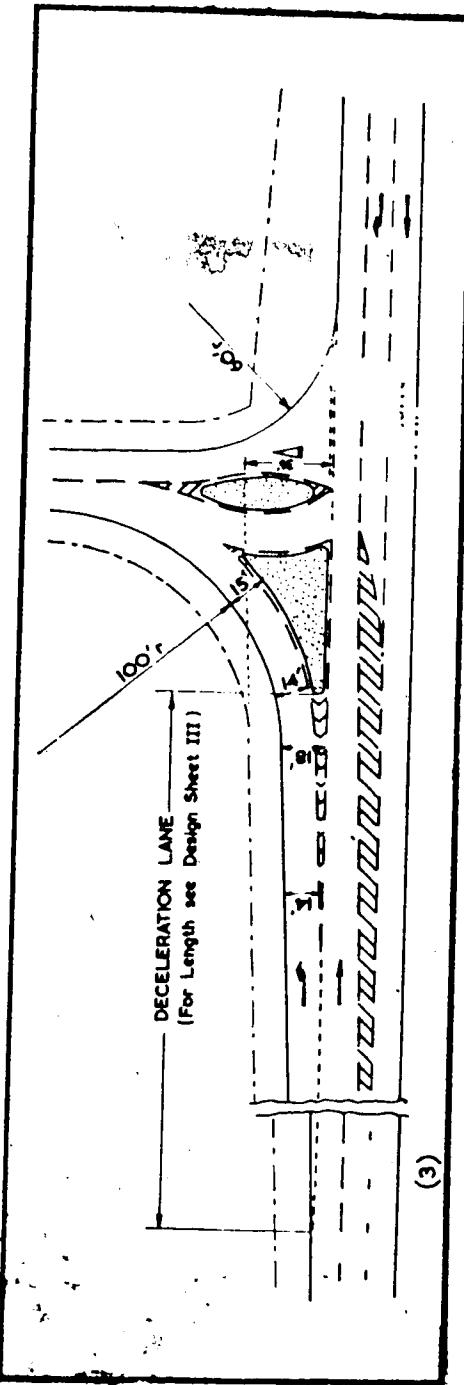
TYPICAL EXIT RAMP TERMINAL-UNITED KINGDOM
